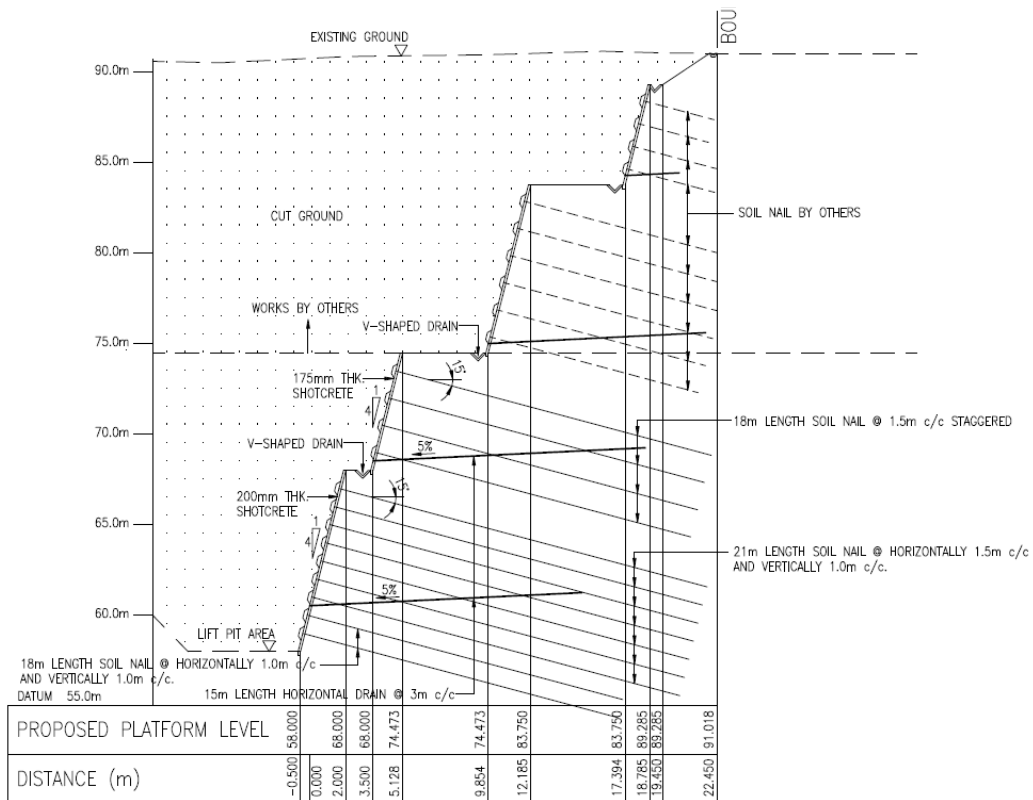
Alternative soil nail system to replace conventional CBP wall with temporary ground anchors.
